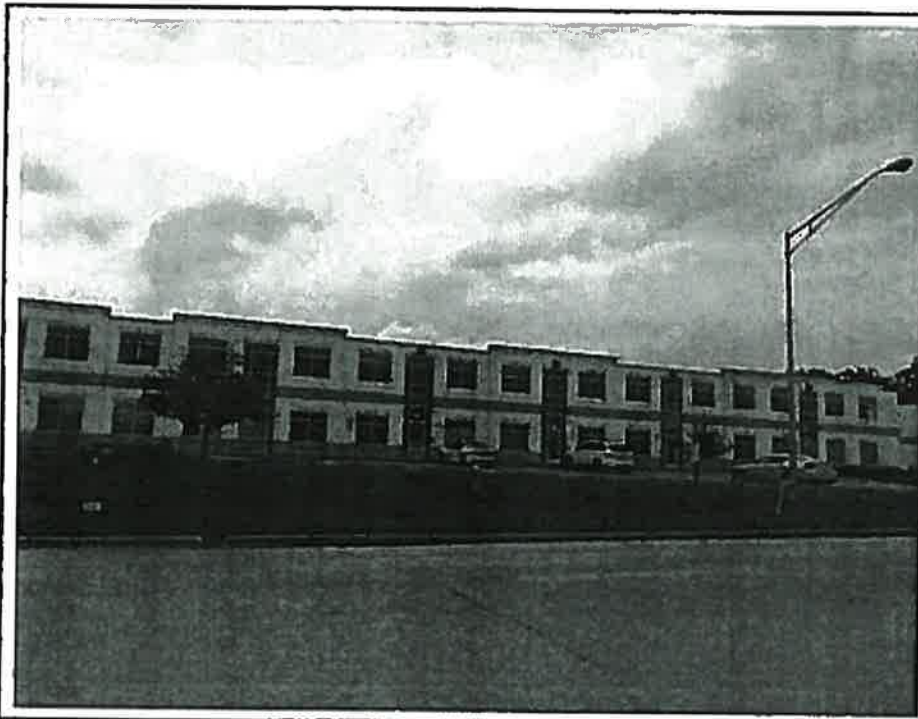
PROPERTY View South Elevations, 17750-17851 Bretz Drive
